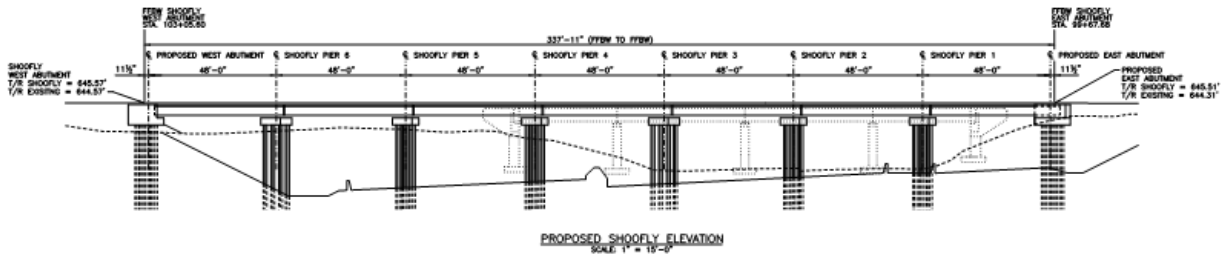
Proposed 7 Span Temporary Shoofly Bridge
